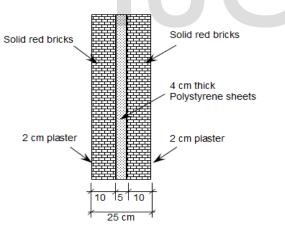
Typical cross section at walls of the study building in Khartoum State
